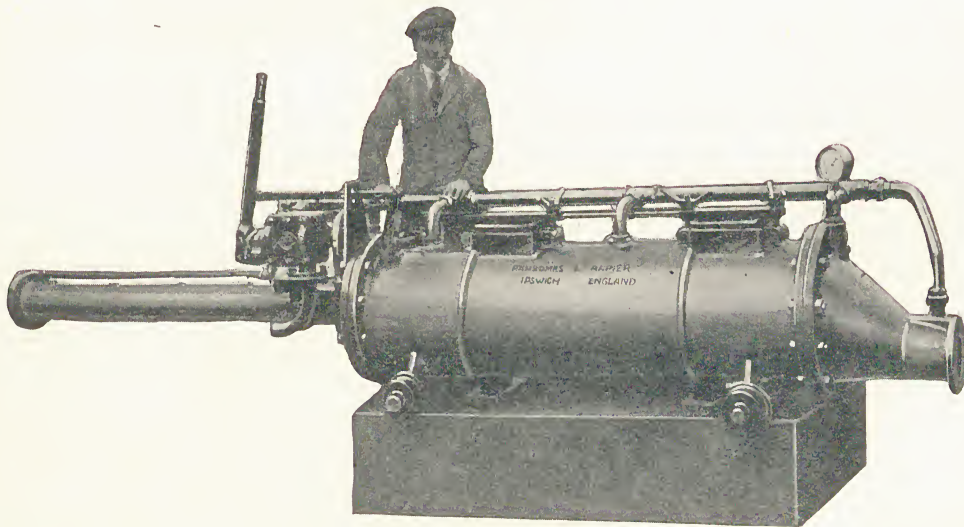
Concrete placer, air operated; concrete blown through piping distance over 100 feet. Deals with batch of 10 cubic feet concrete per hour. Maximum size of aggregate, $1\frac{1}{2}$ inches. (*Ransomes & Rapier, Ltd.*)
